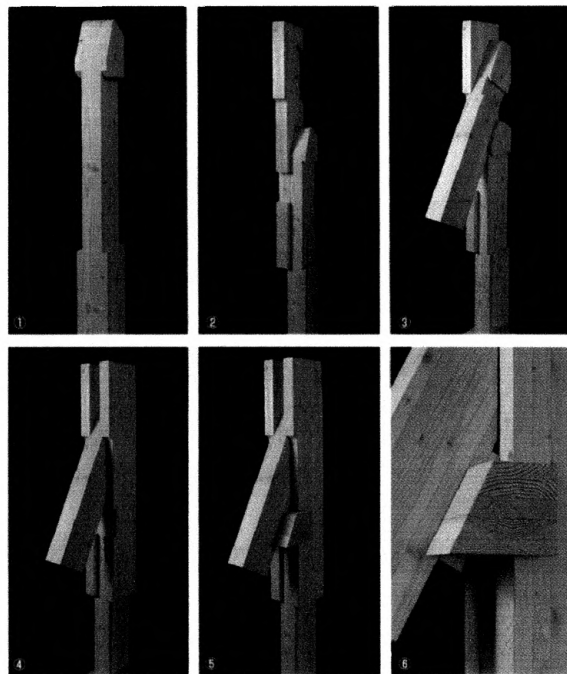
The process of construction of part of the wooden roof structure by full-scale model.
